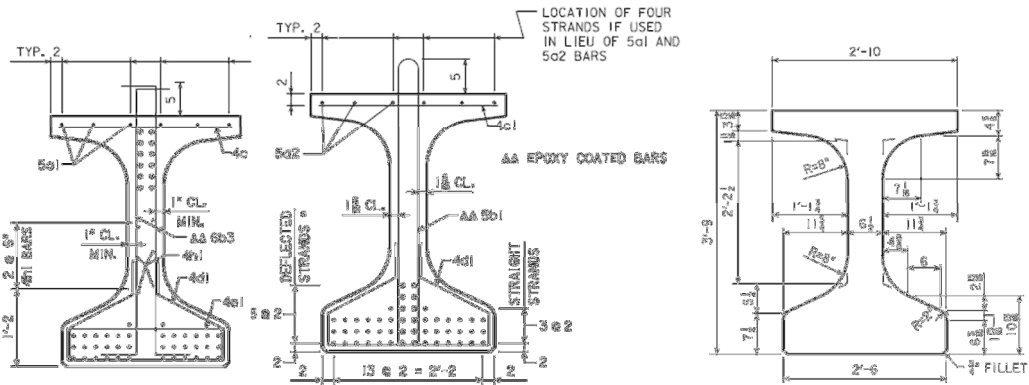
Cross section of the end span, the mid-span and the gross cross section of BTC 120 girder
